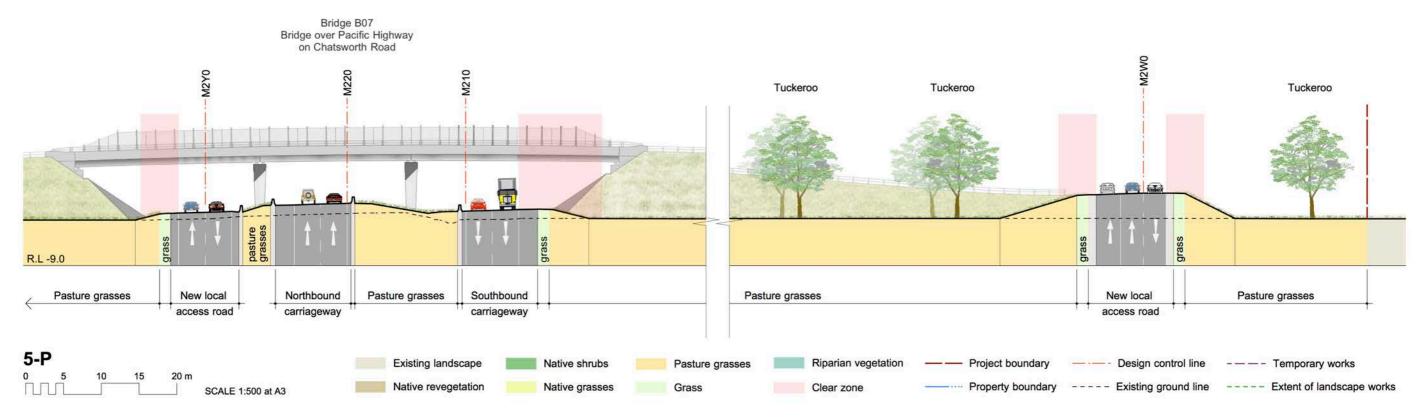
Section 5-P at Bridge B07 – Bridge over Pacific Highway at Chatsworth Road
